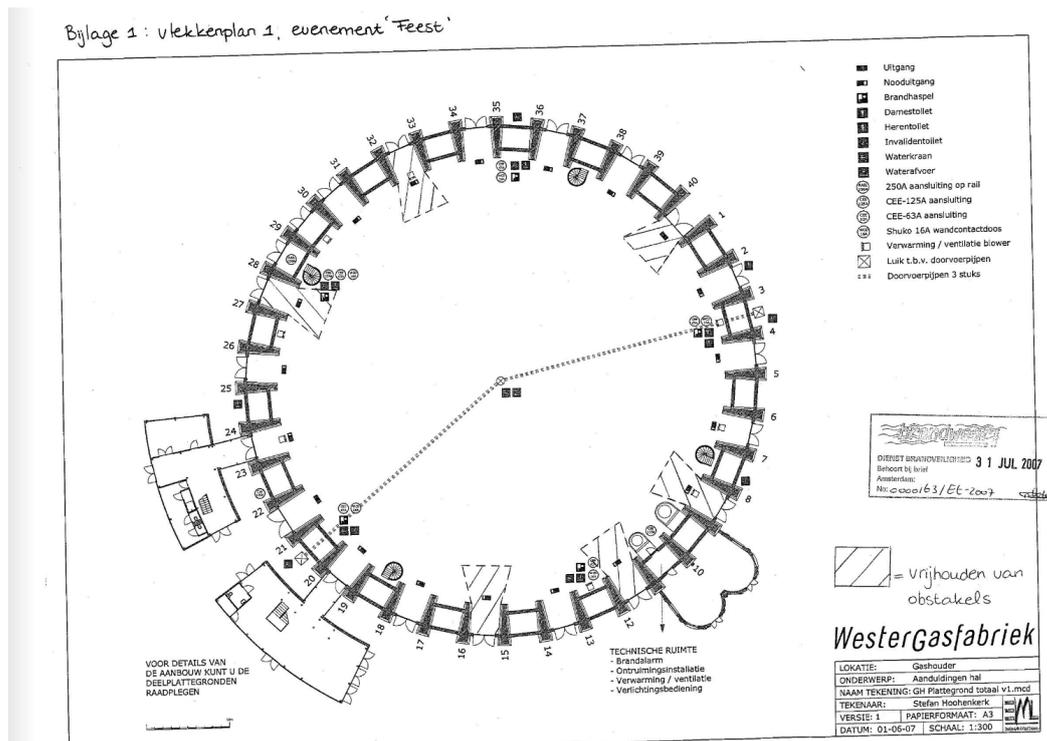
Floor plan of the newly constructed multifunctional silo (Yumpu.com, z.d.)
